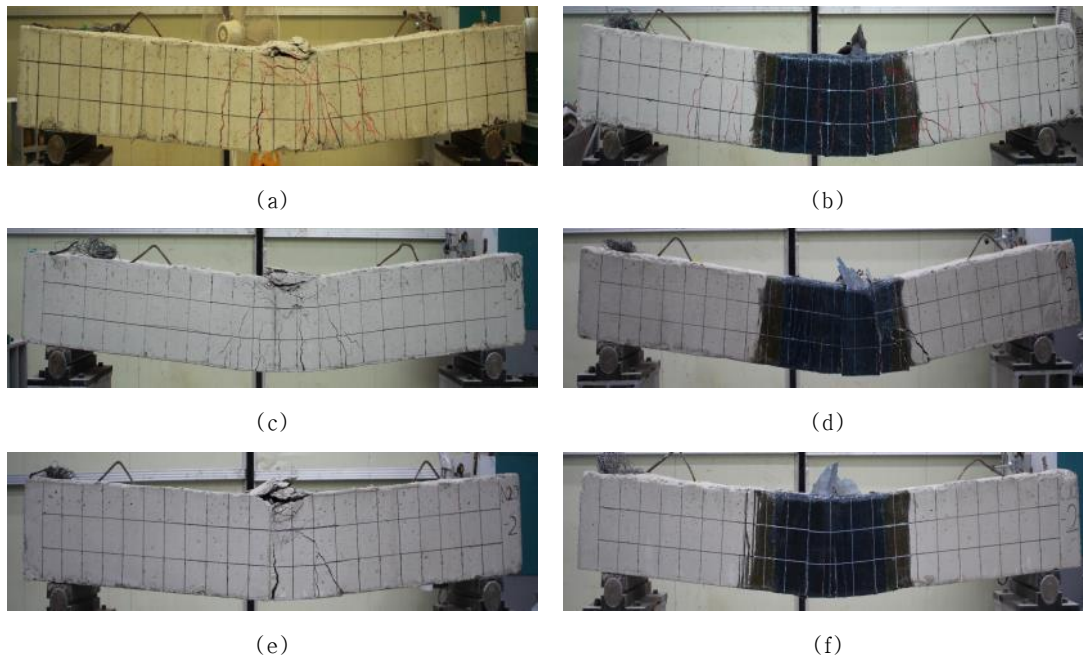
Final Failure Mode of Specimens: (a) N0, (b) C0, (c) N10, (d) C10, (e) N20, (f) C20
